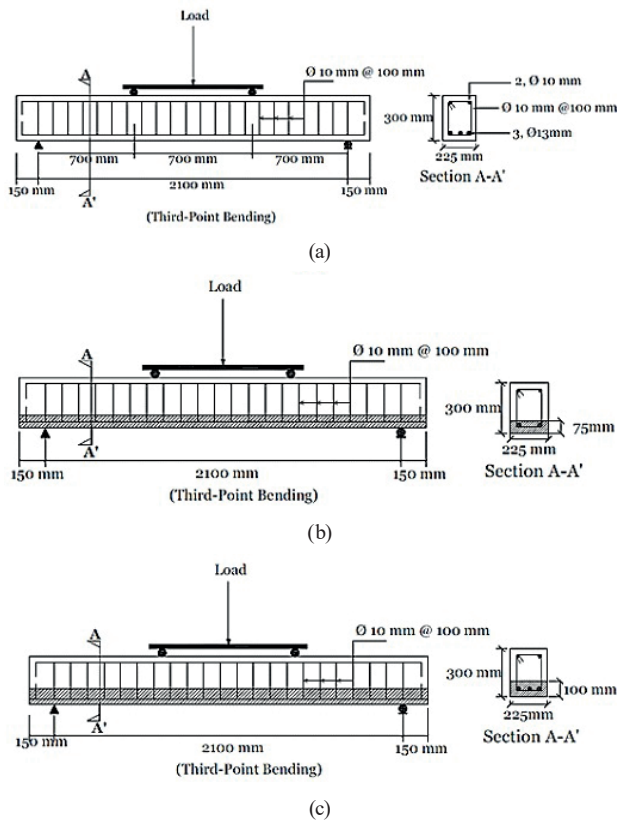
Geometry and reinforcement configuration of beams, (a) RC control specimen, (b) RECC 75mm layer specimen, (c) RECC 100 mm specimen
